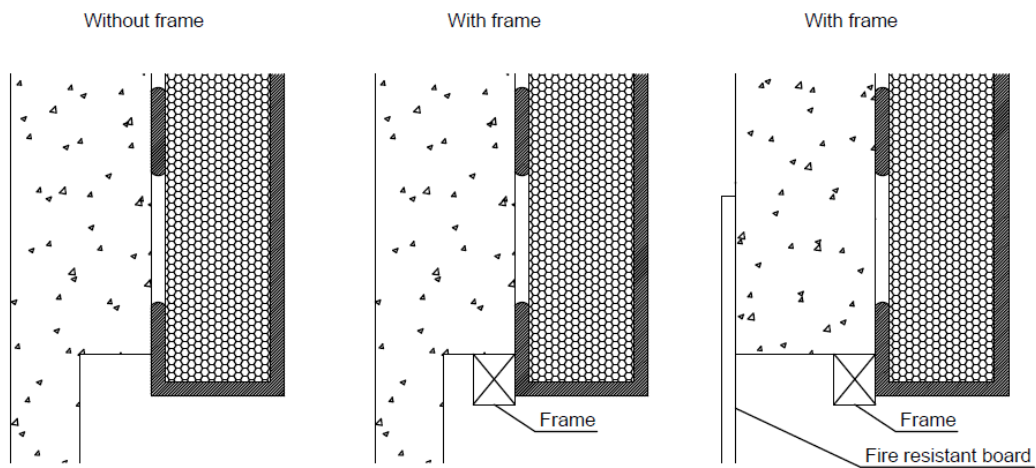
Window mounted flush with the outer edge of the wall supporting the façade system.
